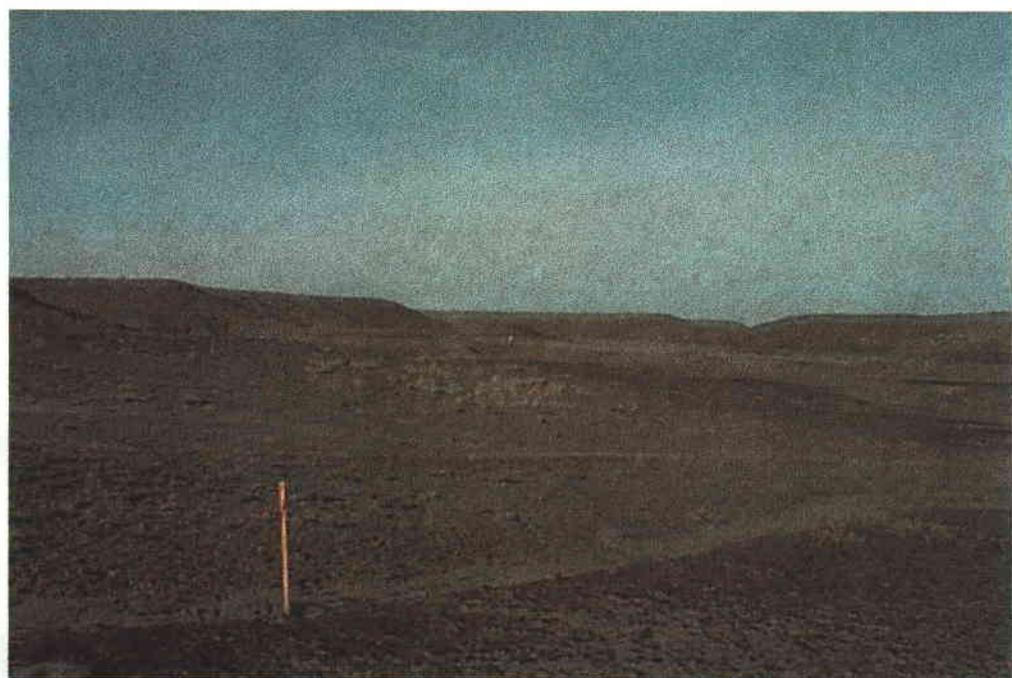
PHOTOS OF PROPOSED SITE WILL BE PLACED ON FILE.
